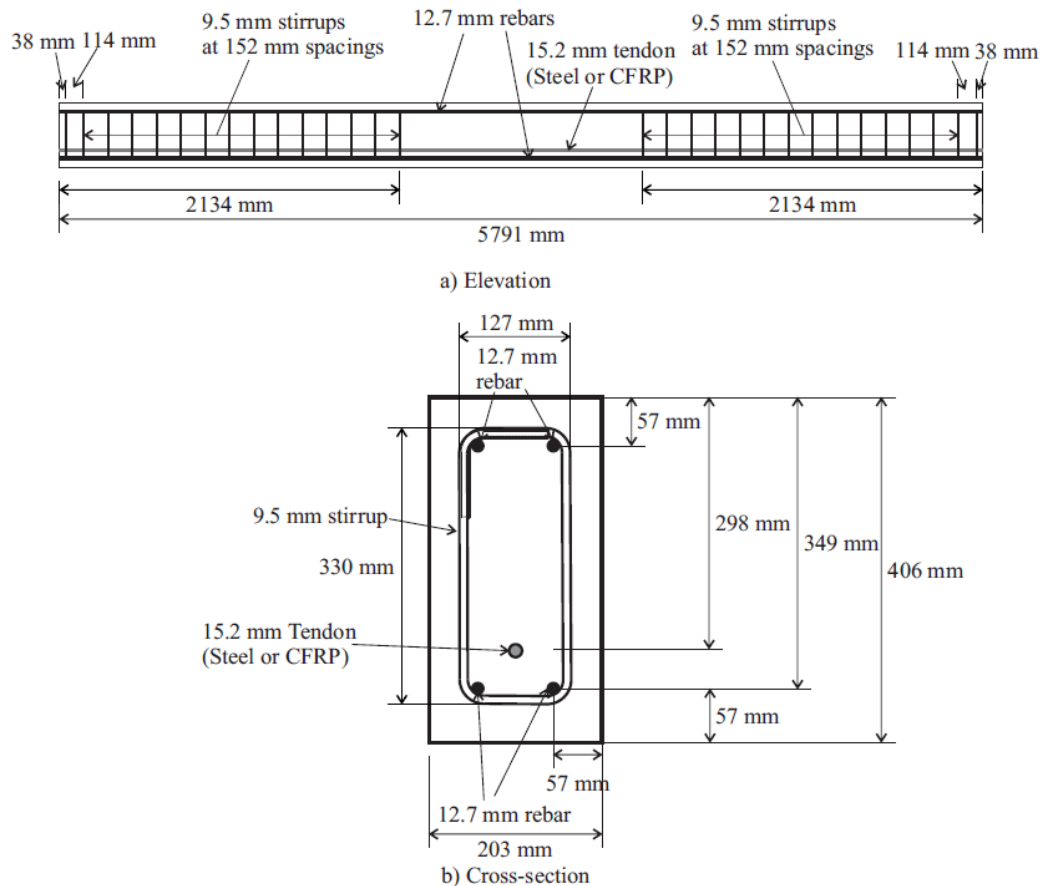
UHPFRC Beam: a) elevation; b) cross-section
